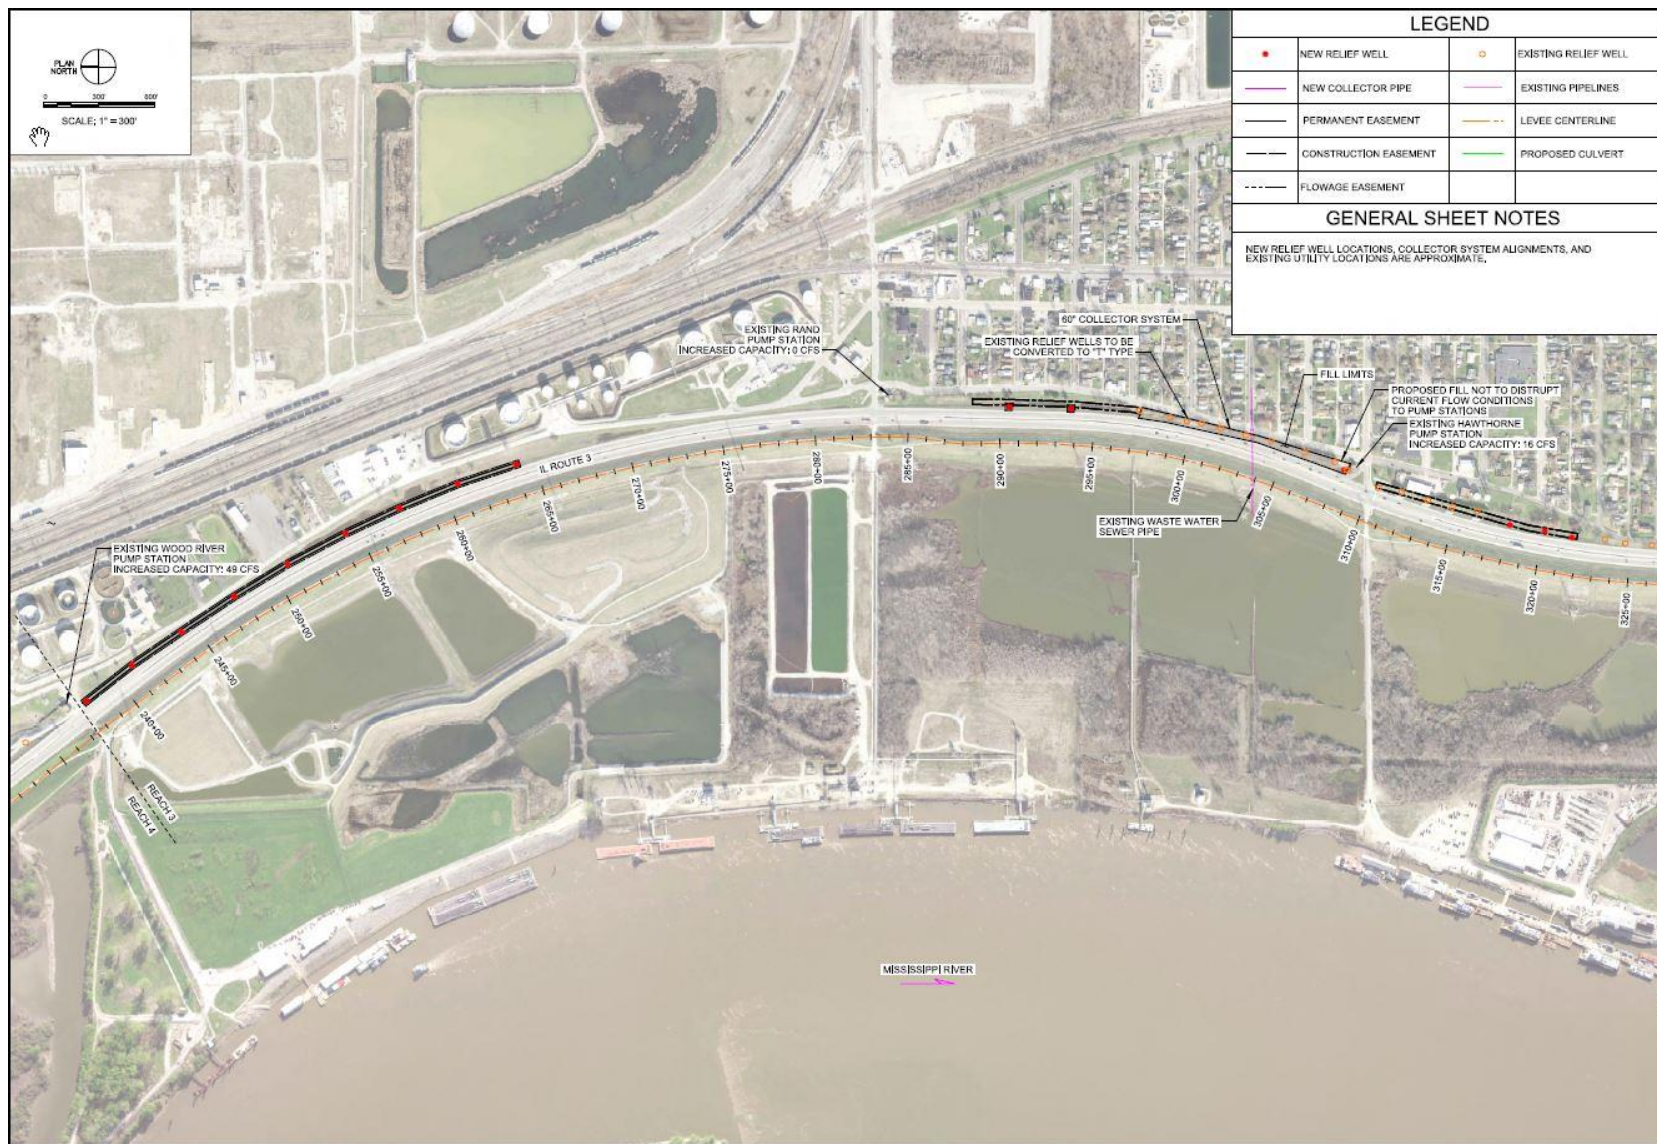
Proposed features for reach 3 for the Standards Plan and Standards Plan with Reach Screening Alternatives.
